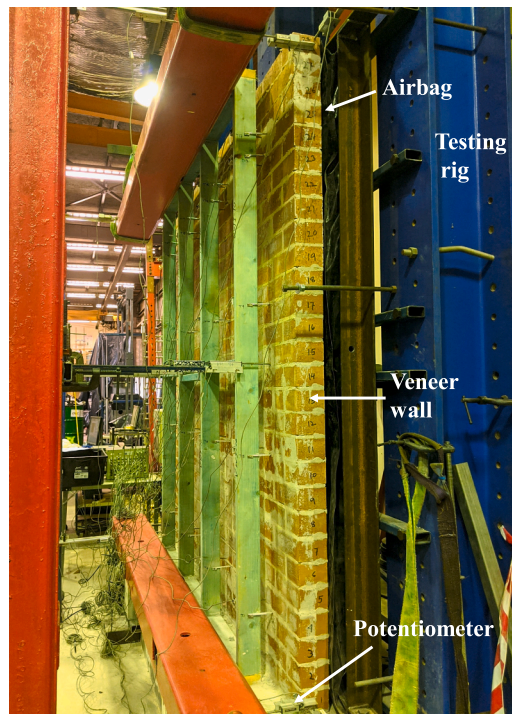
Elevation of the full-sized URM veneer wall system [21].
